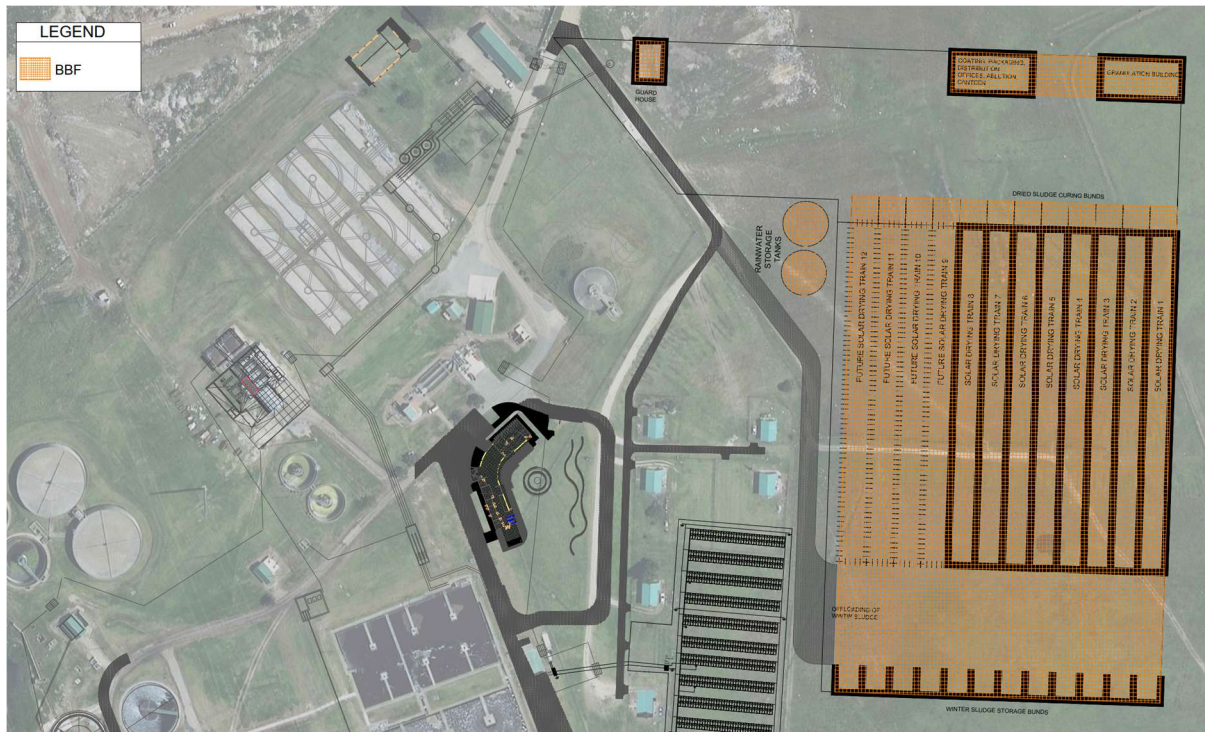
Layout of the Bio-Solids Beneficiation Facility phase layout
